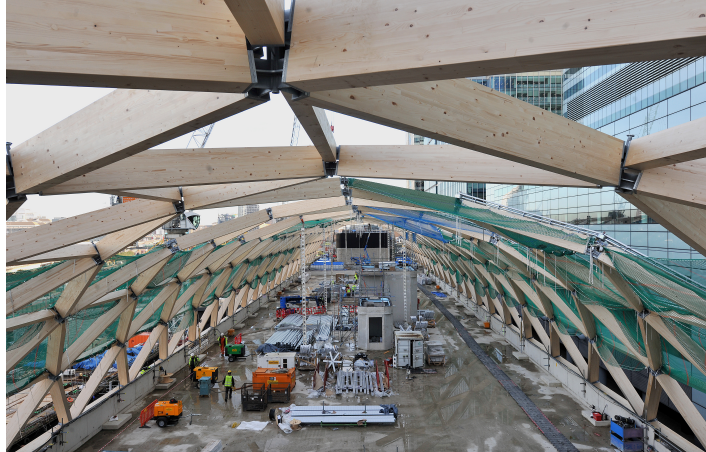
Discrete timber gridshell under construction at Crossrail Place in London, Photo: ©Arup (2013)
